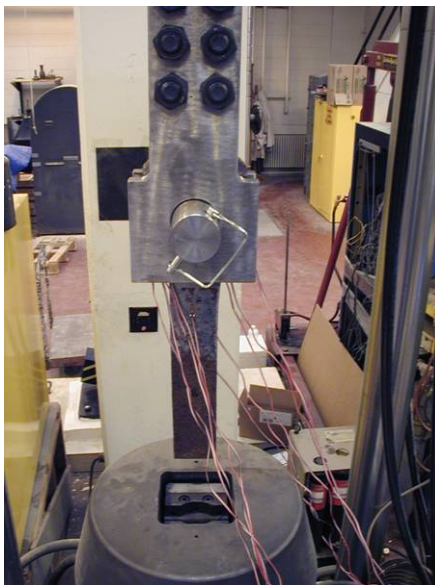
View of Eyebar End Connection with Pin Inserted through the Testing Attachment.
